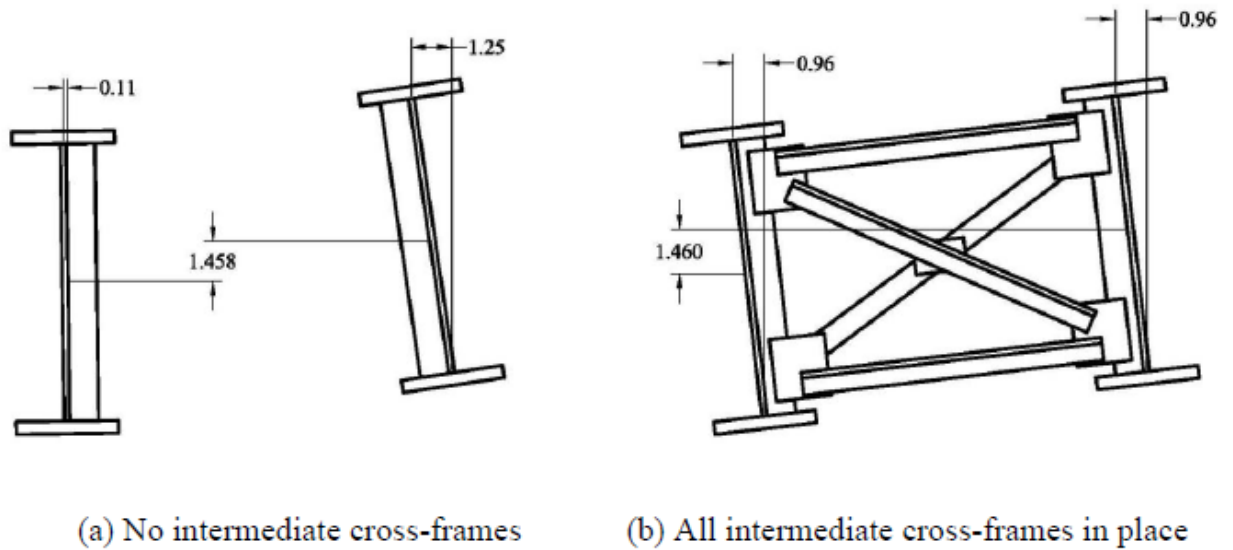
Layover compatibility between adjacent girders enforced by an intermediate cross-frame, from Sanchez (2011).
